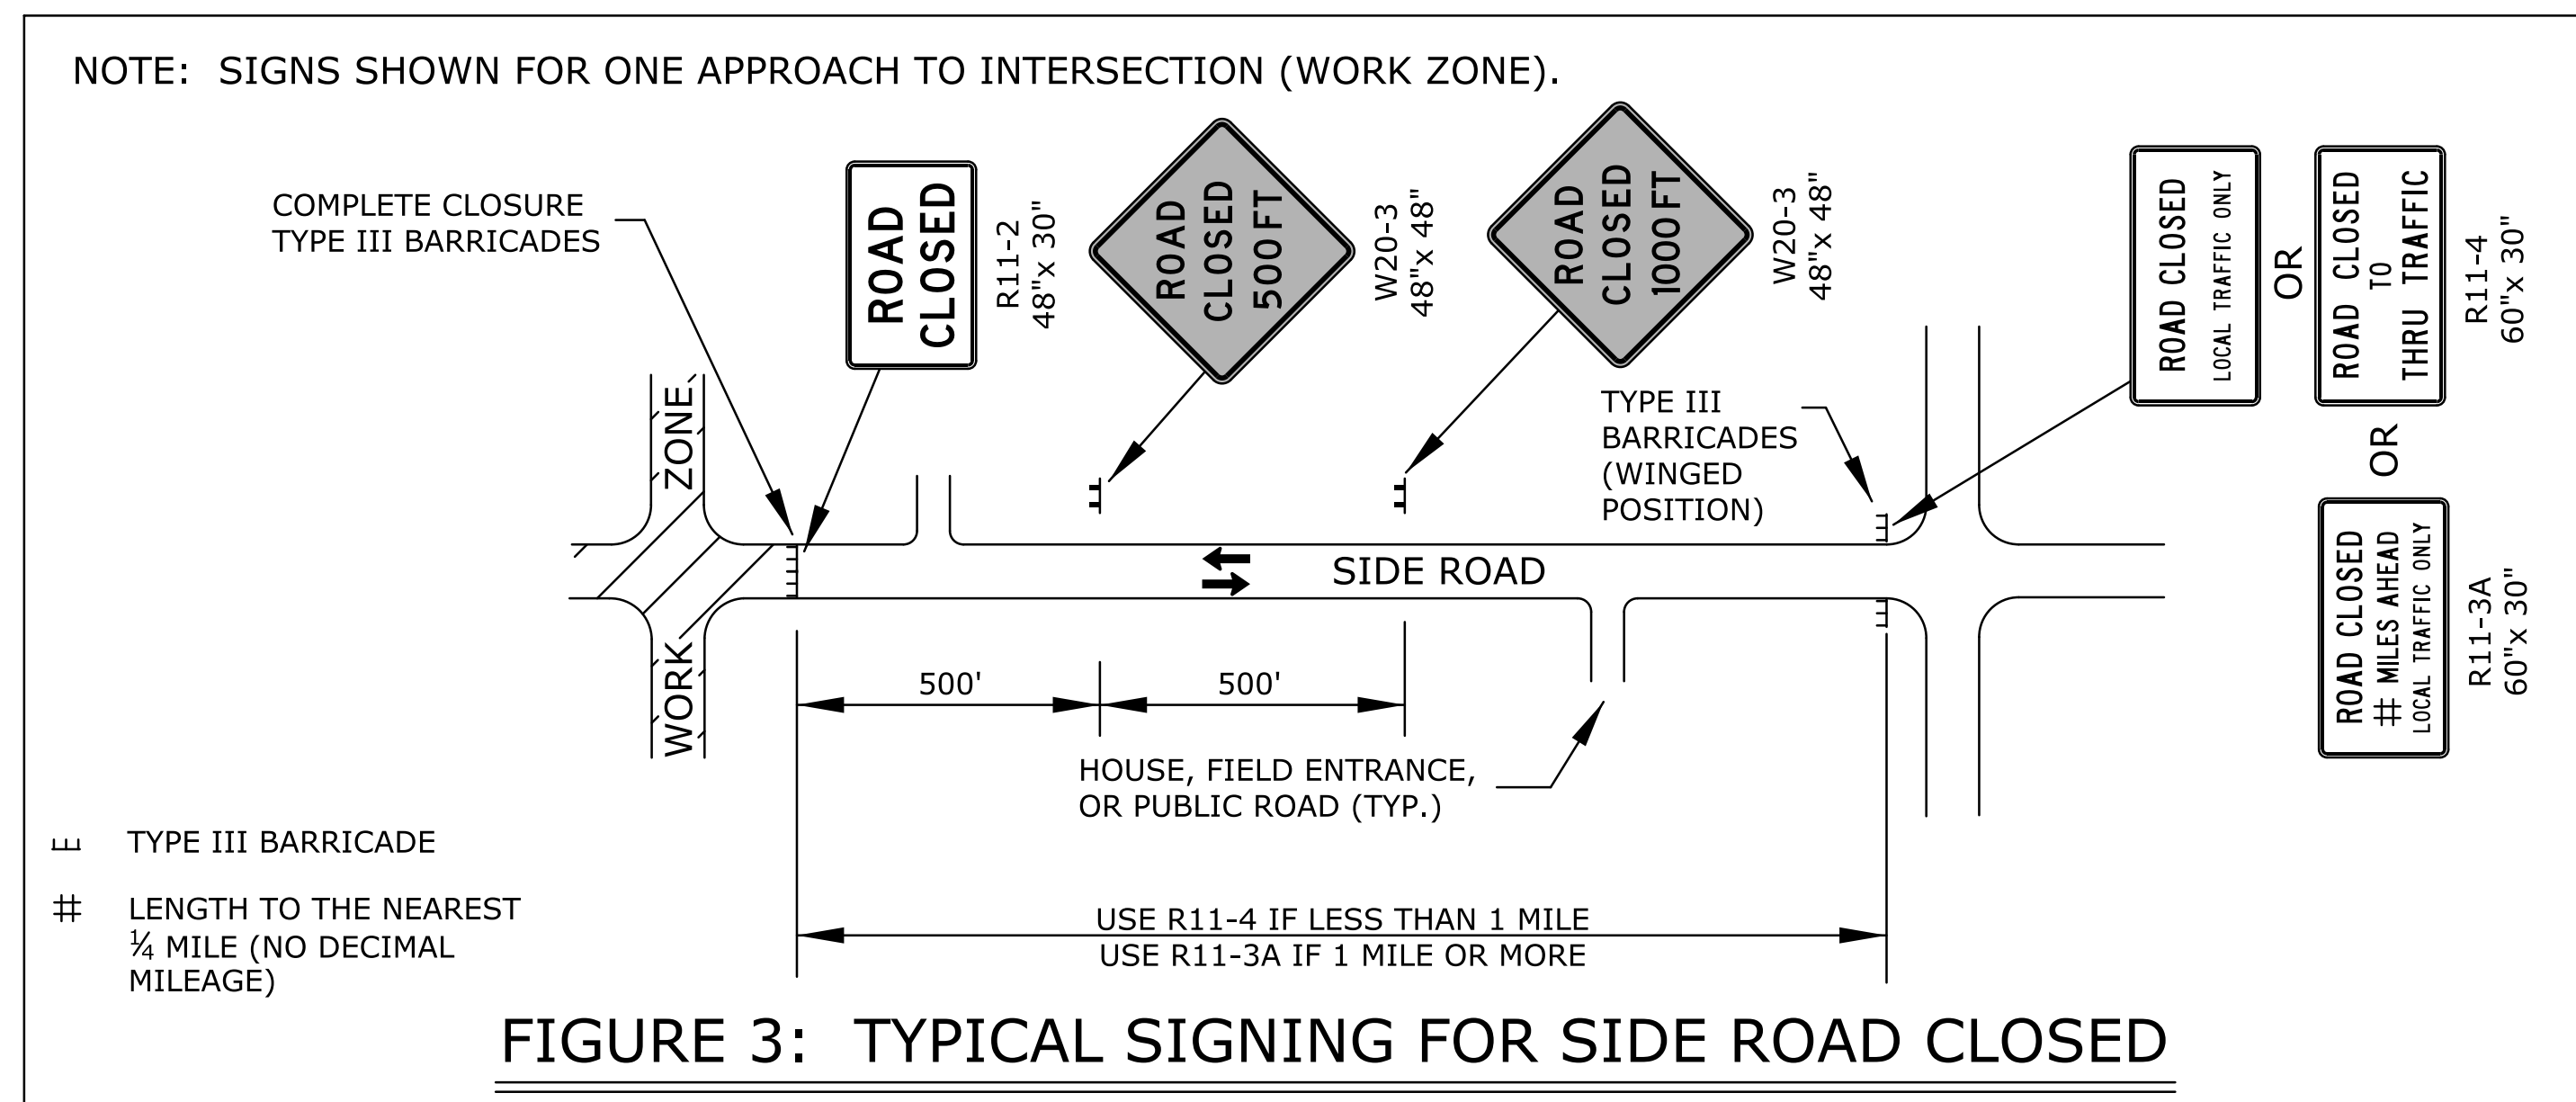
TYPICAL SIGNING FOR SIDE ROAD CLOSED
